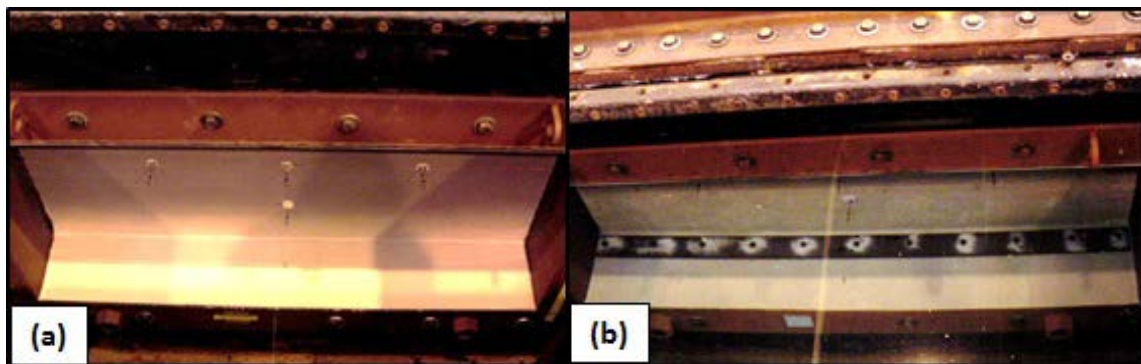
Anchorage. (a) System 1 – Relying solely on the adhesive strength of the retrofit material to the steel frame. (b) System 2 – Steel plates bolted to the top and bottom supports to anchor the retrofit material in static experiments.
